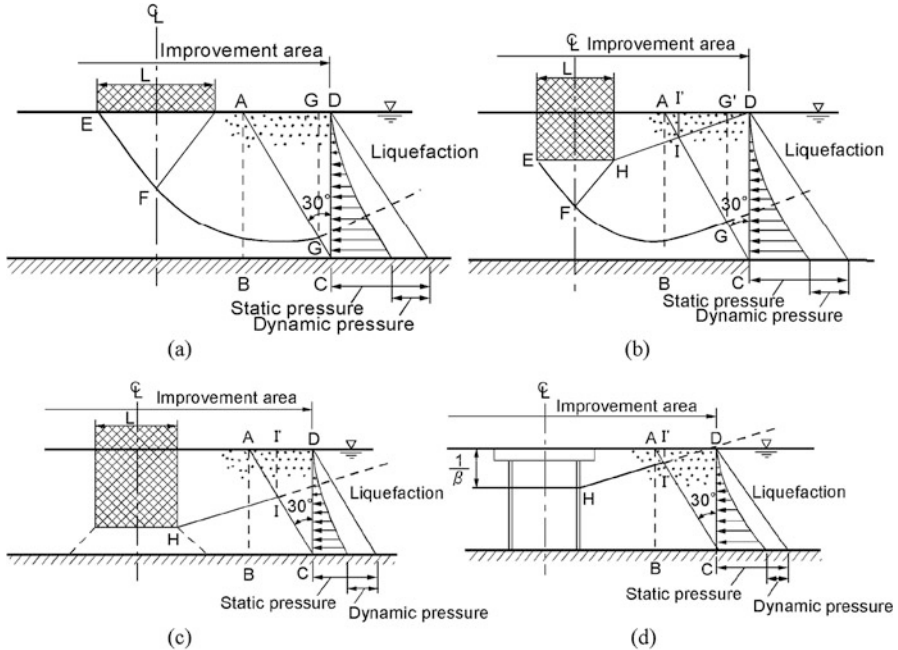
Schematic diagrams for investigation of stability for determining the soil improvement area (Port and Harbour Research Institute 1997; Iai et al. 1987). (a) Shallow foundation. (b) Foundation with shallow embedment. (c) Foundation with deep embedment. (d) Pile foundation
